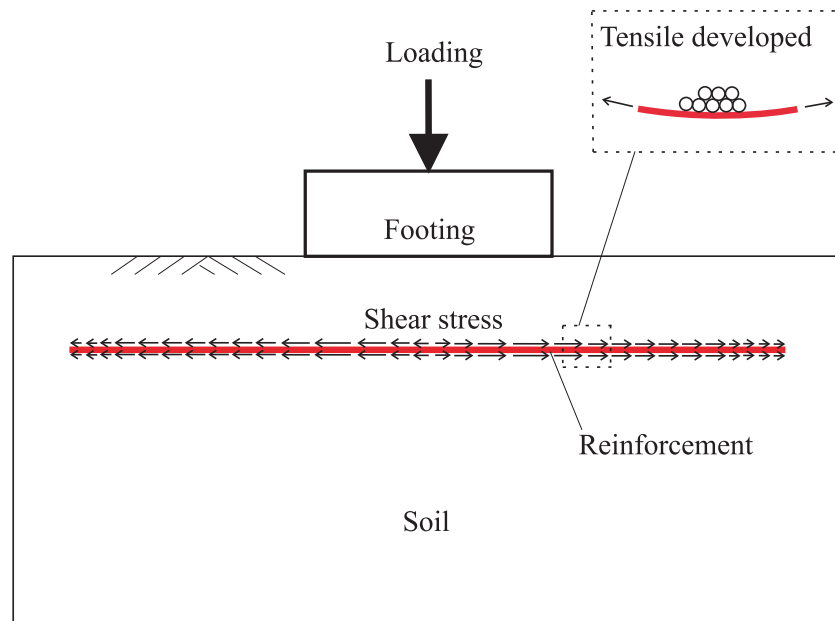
Illustration of the soil foundation reinforced with horizontal layer of reinforcement.
